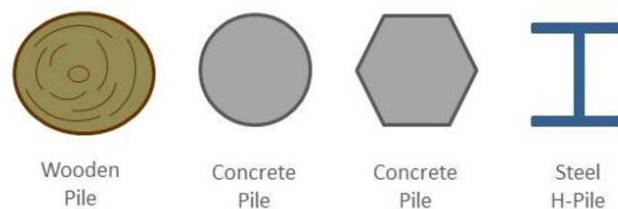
Common pile cross sections and materials (from www.understandconstruction.com)
